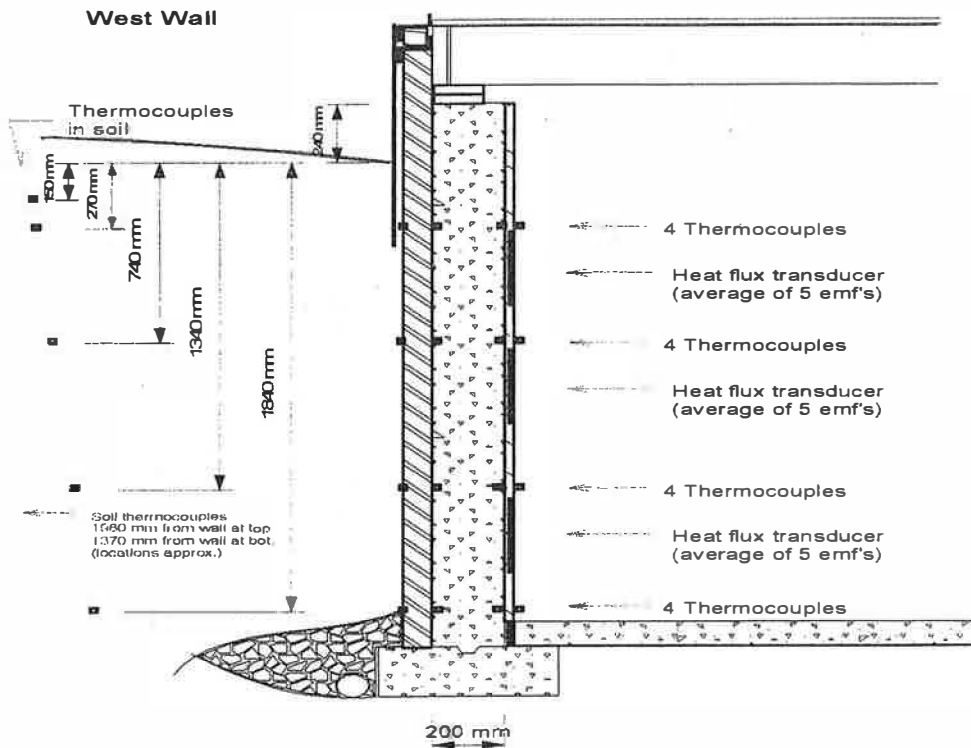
Thermocouples and calibrated insulation specimens mounted on the west wall.
